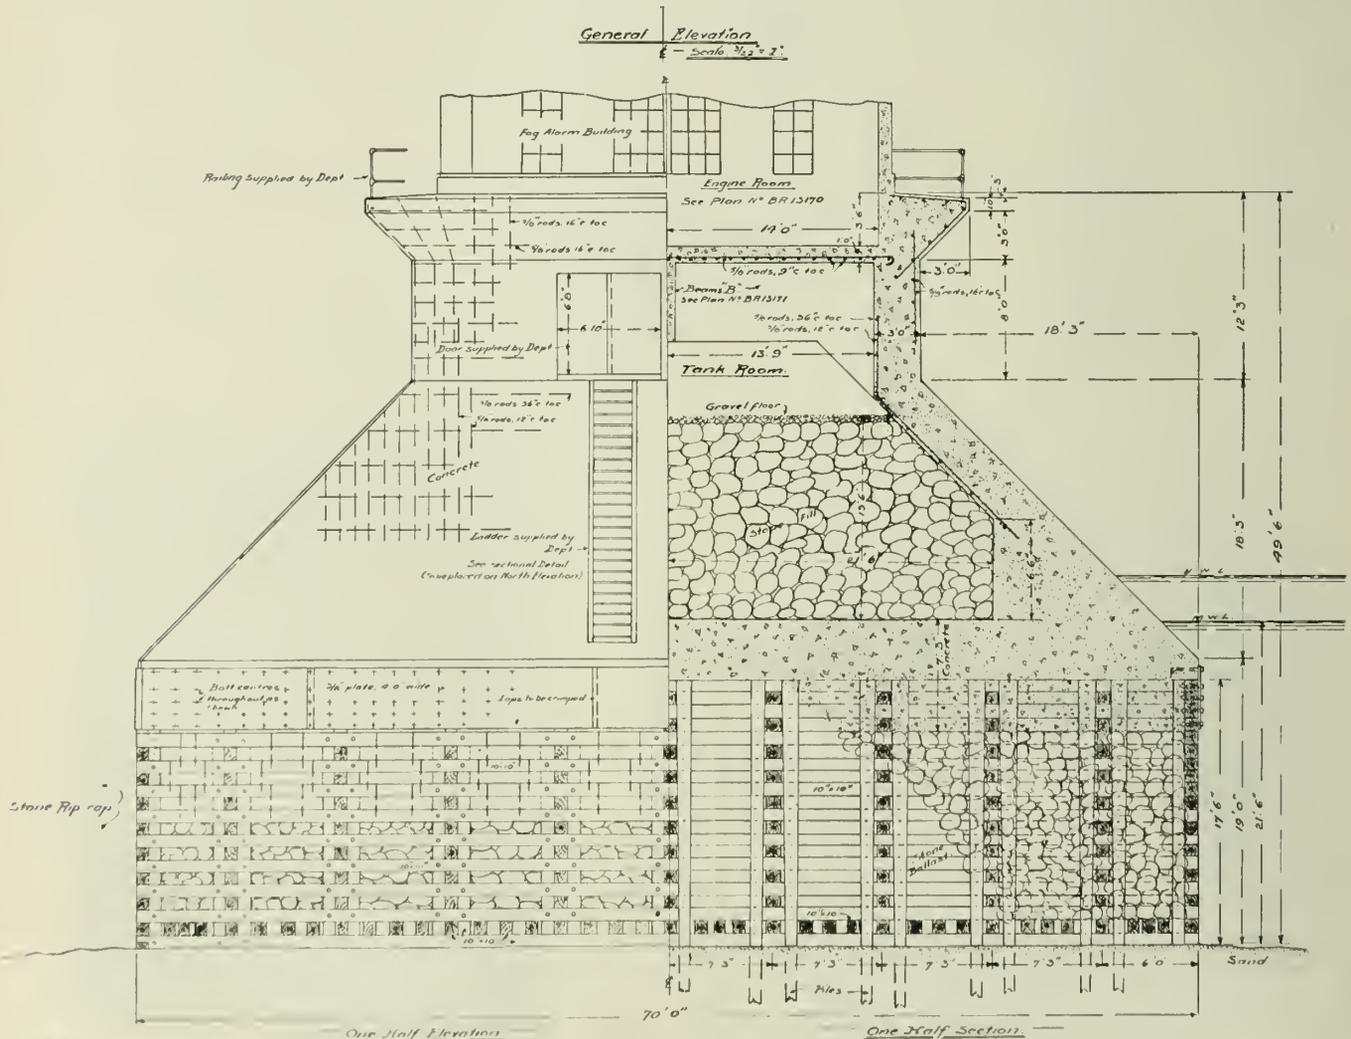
Elevation and Section, Southeast Shoal Lightstation.
